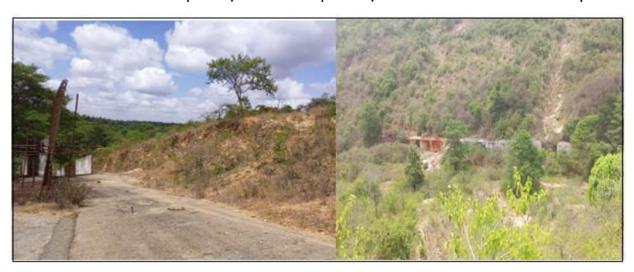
partially constructed concrete spillway and reinforced concrete diversion culvert
